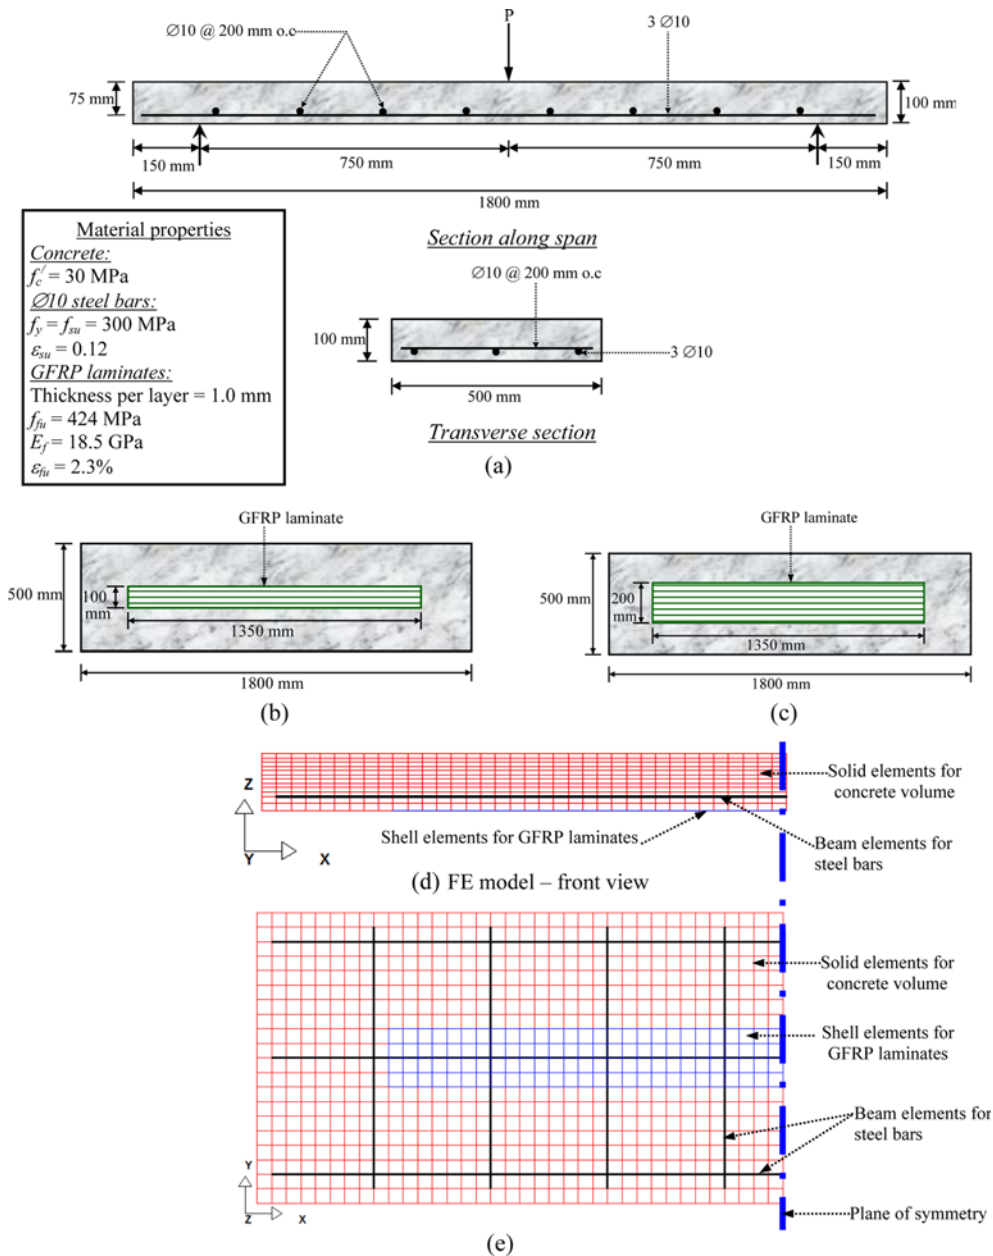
Details of Slabs used in the Parametric Study: (a) Control Specimen S-1, (b) Strengthened Specimens S-2 to S-14, (c) Strengthened Specimens S-15 to S-27, (d) FE Model – Front View, (e) FE Model – Bottom View
